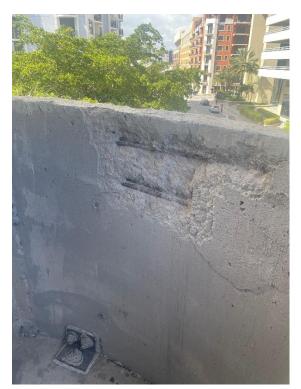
Spalled concrete at the top of a guard rail wall.
